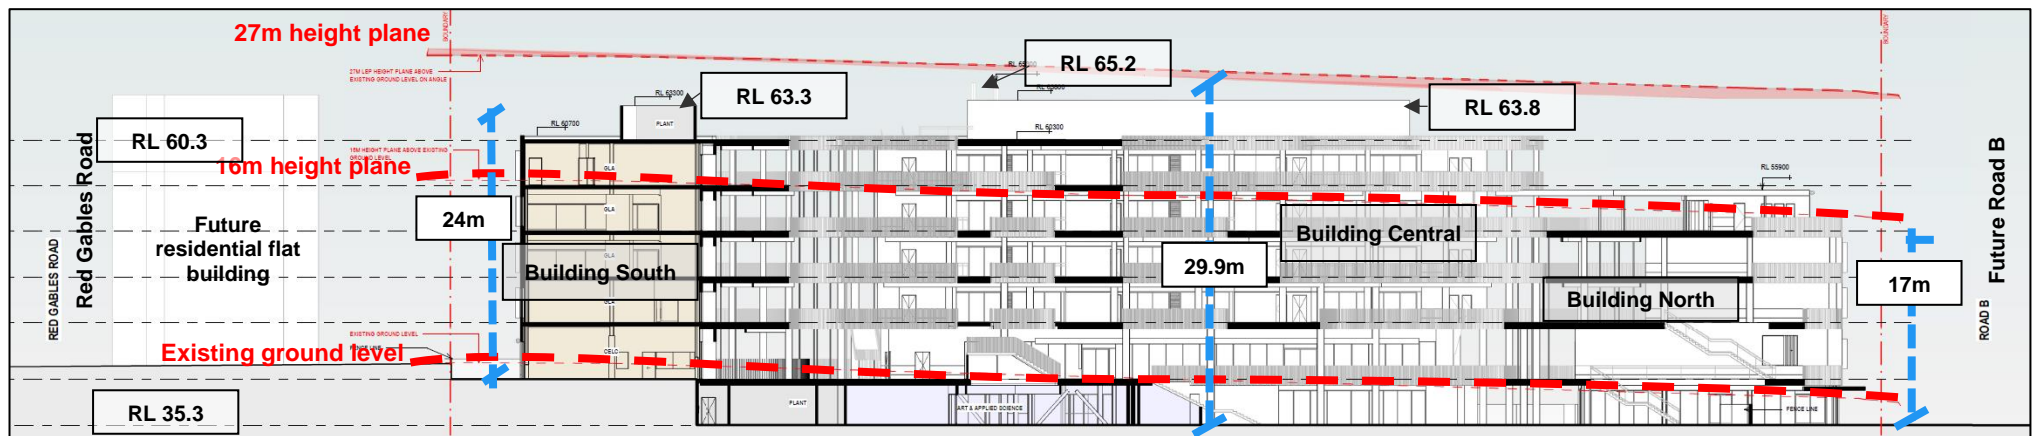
| North-South section through the site (Source: Applicant's SRtS)
